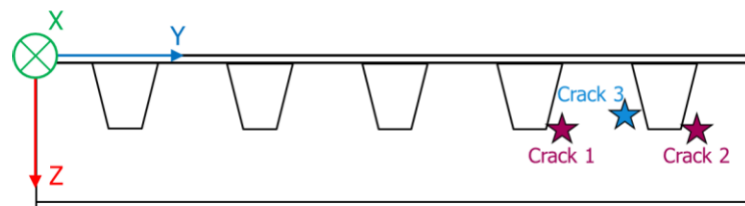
Schematic cross-section of the bridge deck with location of the fatigue crack
